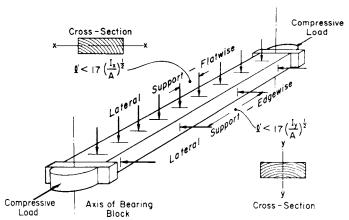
Minimum Spacing of Lateral Supports of Long Columns
